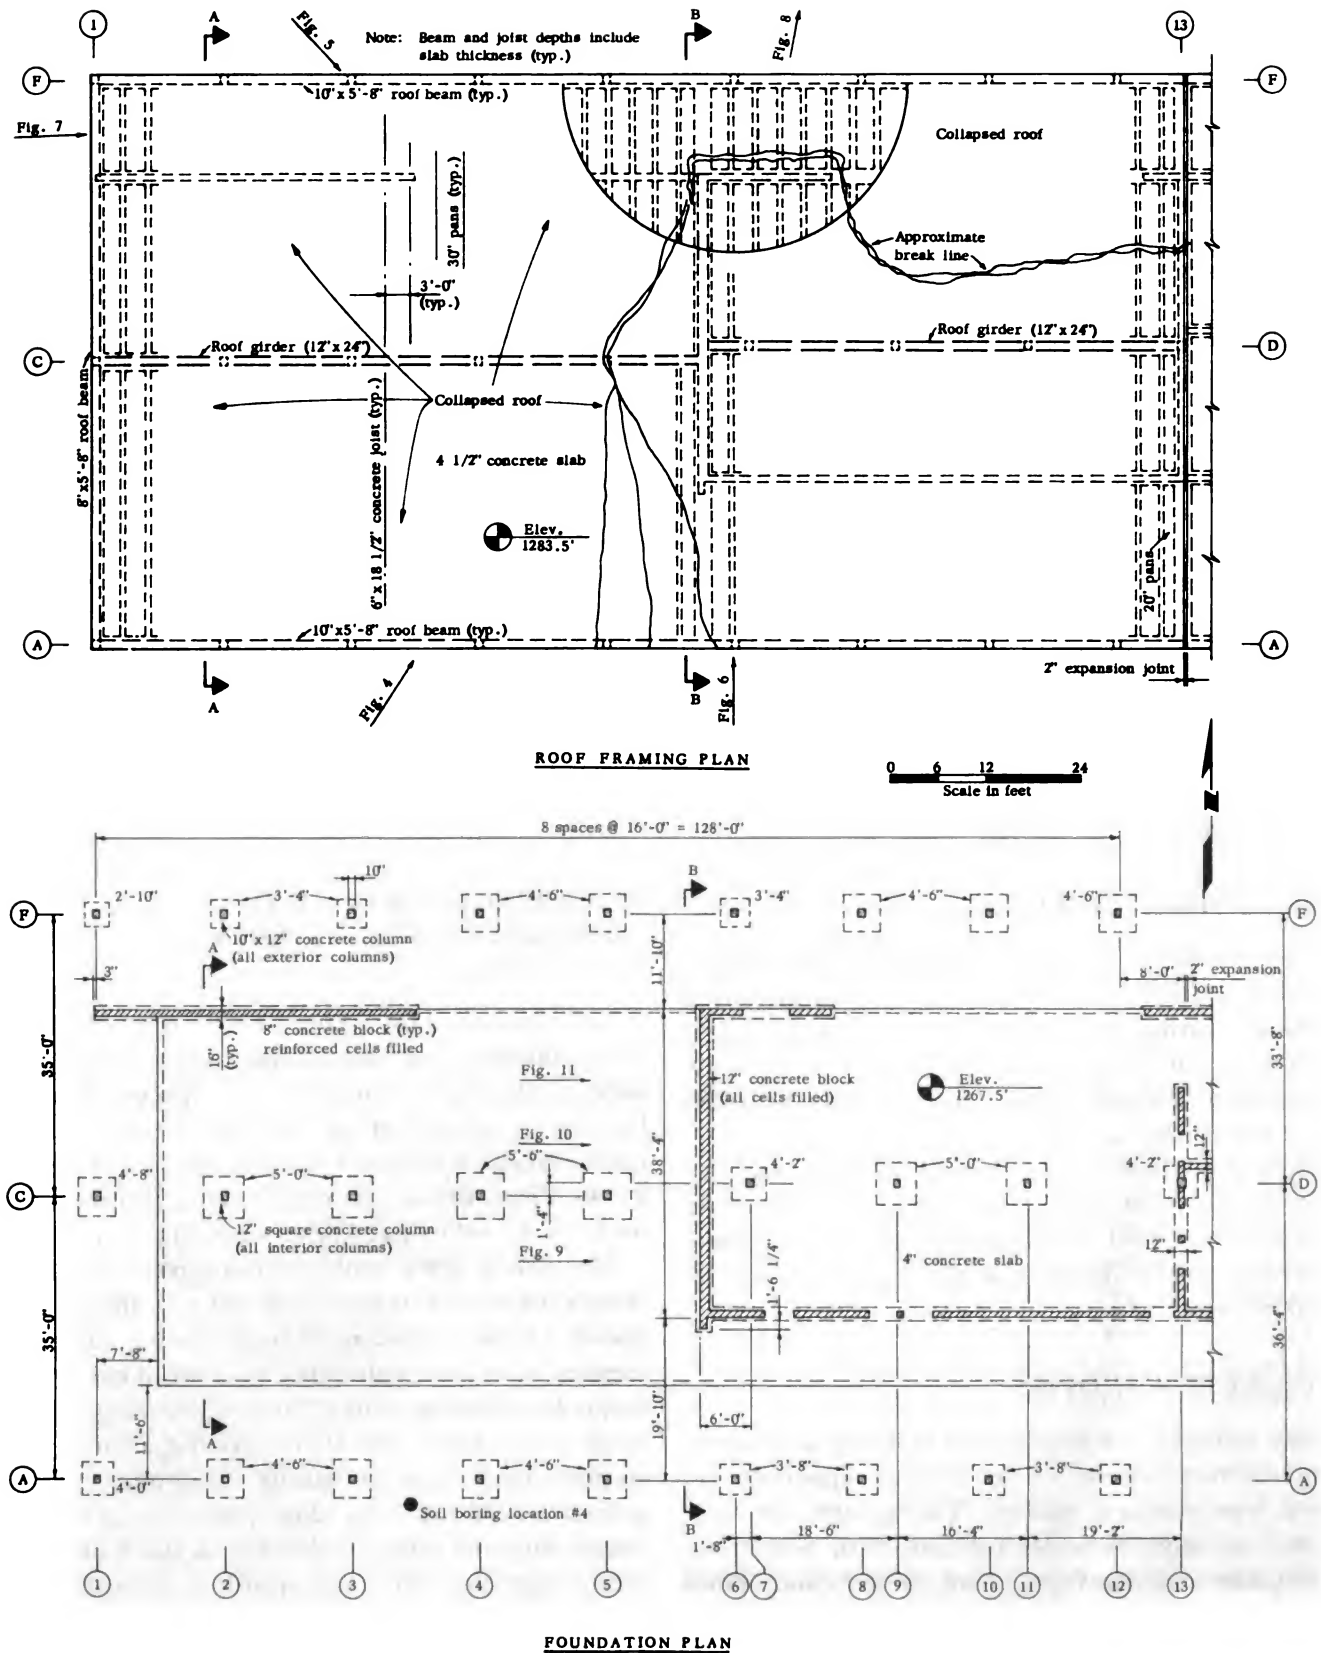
San Fernando Valley Juvenile Hall, Administration Building, west wing. Roof framing plan and foundation plan.
